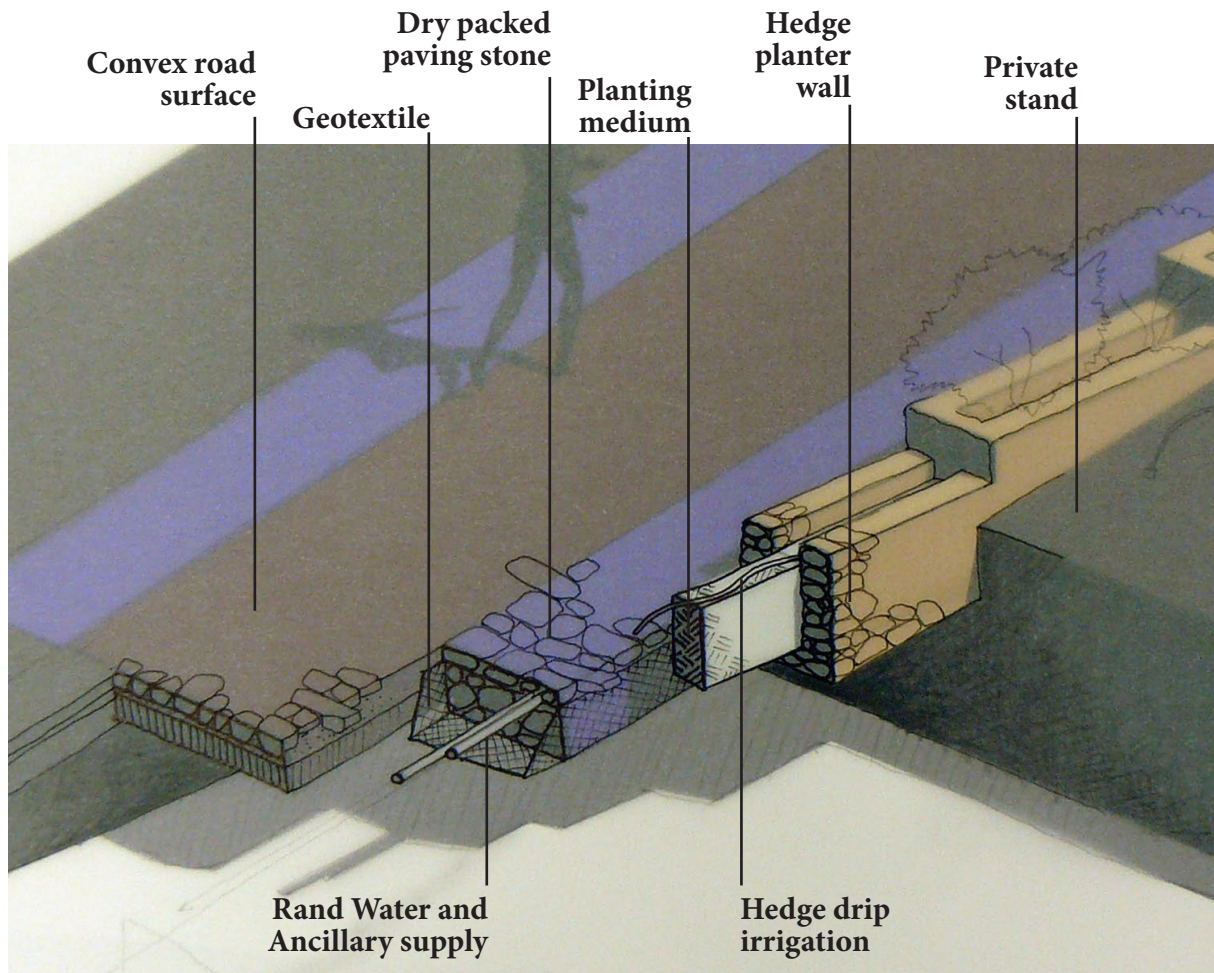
Road surface bordered by drainage channel bordered by planter wall (Author 2015)
